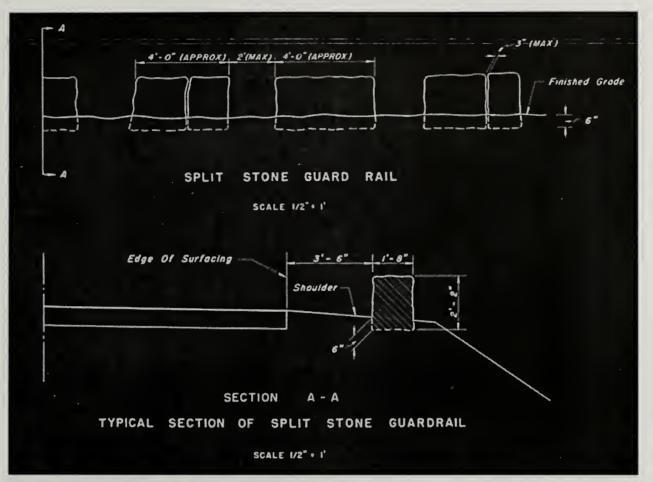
Cross-section and detail for a rectilinear quarried block guardwall on Paradise Hill Road, 1952. Length of stones and width of gaps appear to be more consistent. (U.S. Department of Commerce, Bureau of Public Roads, Project 6A5, Sheet 7 of 24, July 1952 and Project 10A6, Sheet 26 of 49, 1952)
